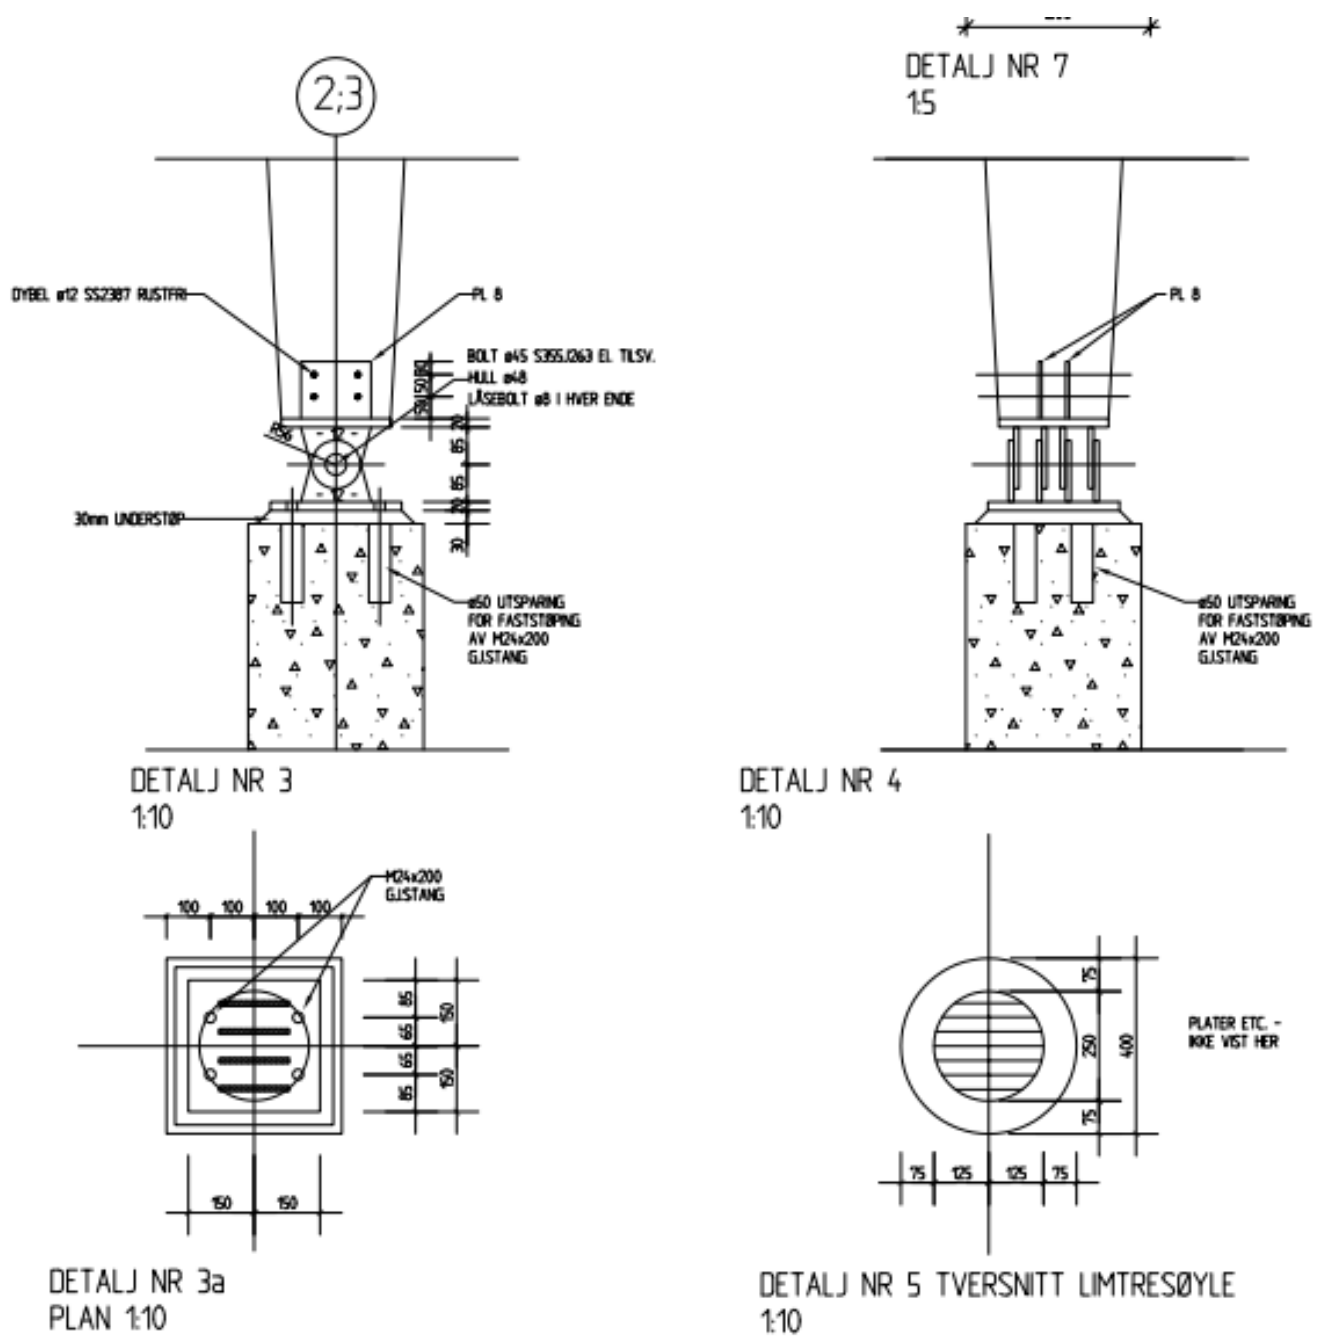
Illustrations with dimensions of the oval columns and connections of the concrete fundaments.
